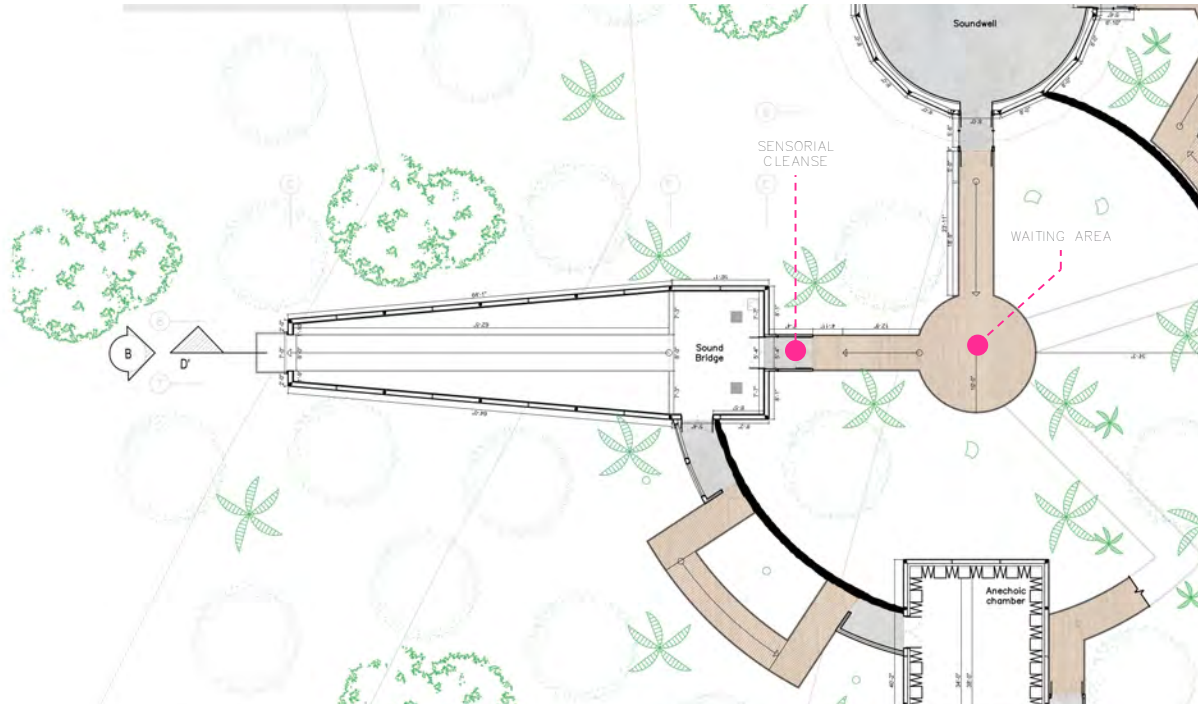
Proposed Ground Floor Plan Sound Bridge. Diagram by student Reinaldo E. Hernandez Arcena.
